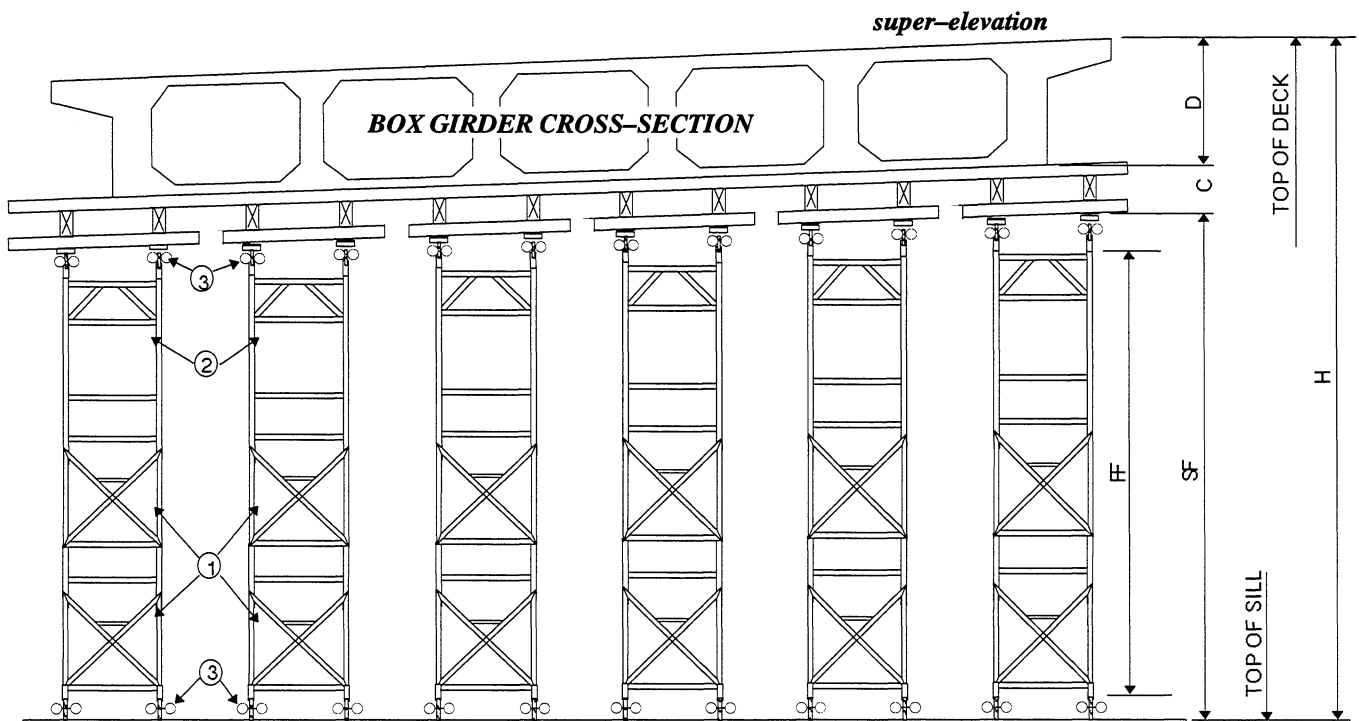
1 Calculations for Shoring Fill on Outboard (Exterior) Towers
